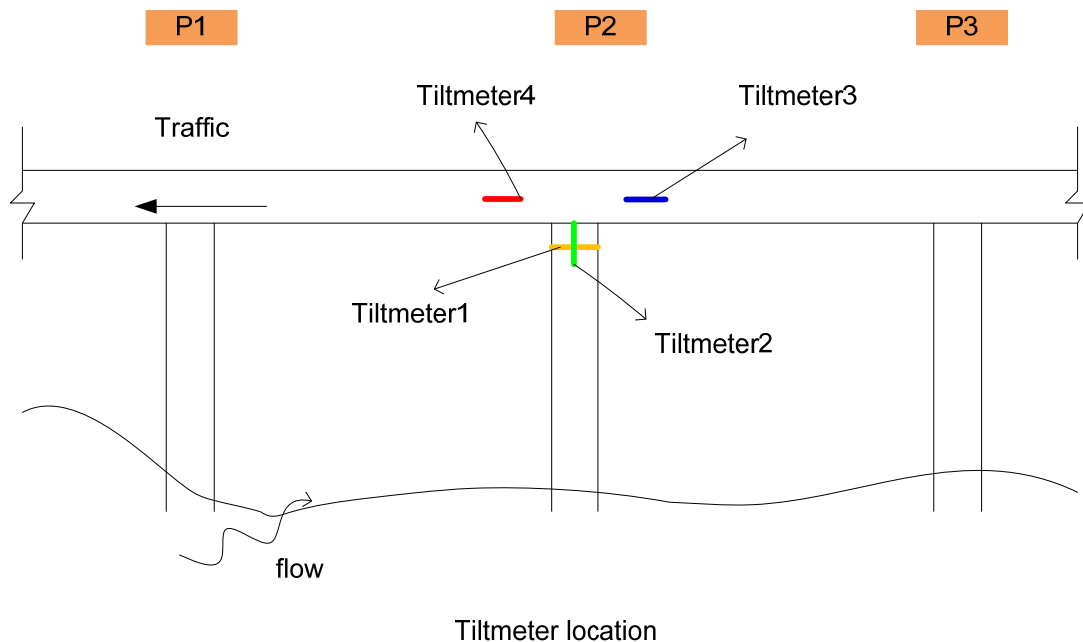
Layout of the Tiltmeter Locations on SH80 over San Antonio River Bridge.
